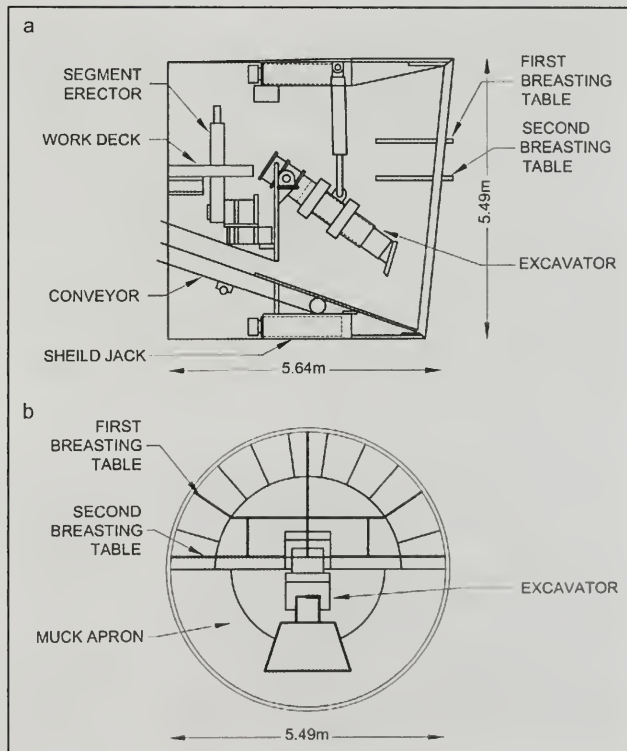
Digger shield tunnel boring machine. (a) Side view. (b) Front view.
